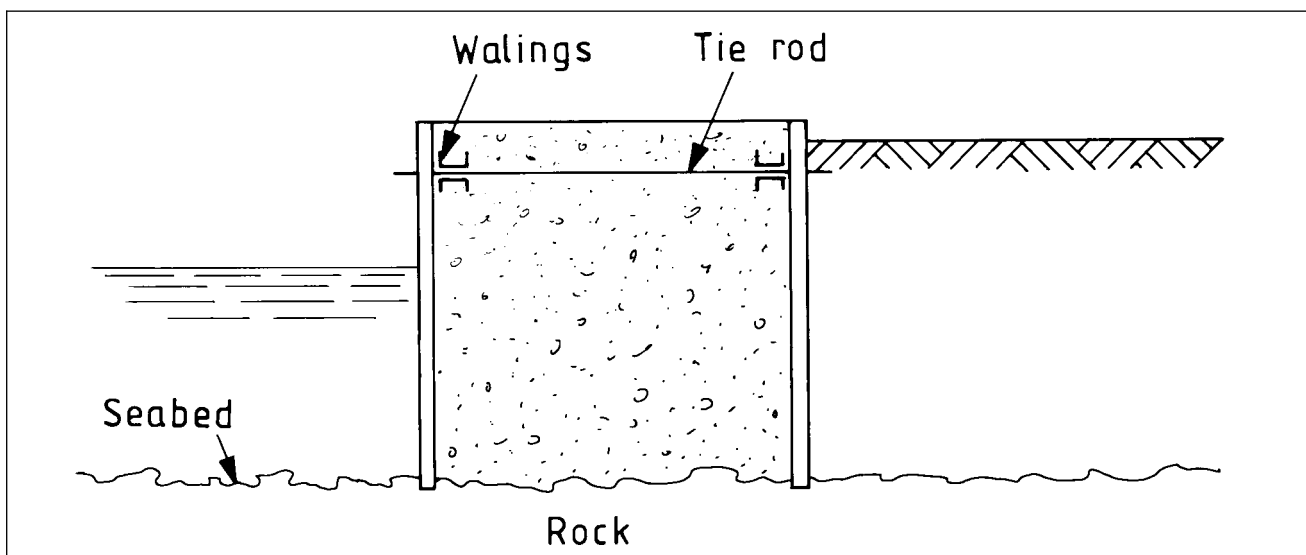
Double-wall sheet pile structures — Sheet piles terminated on rock at seabed
